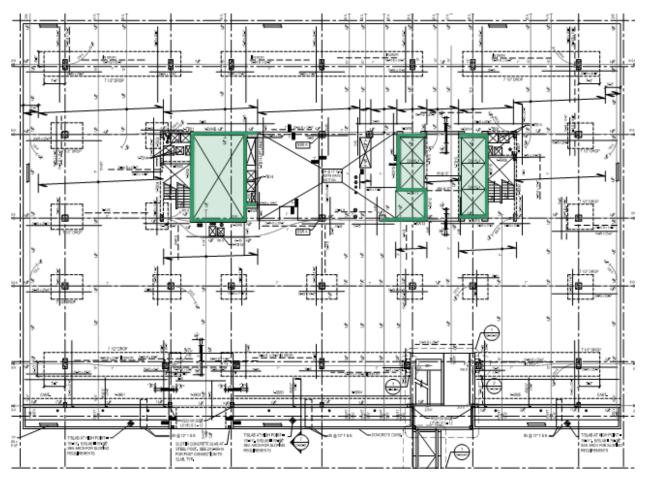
Plan view of the lateral system with shear walls shown in dark green.
